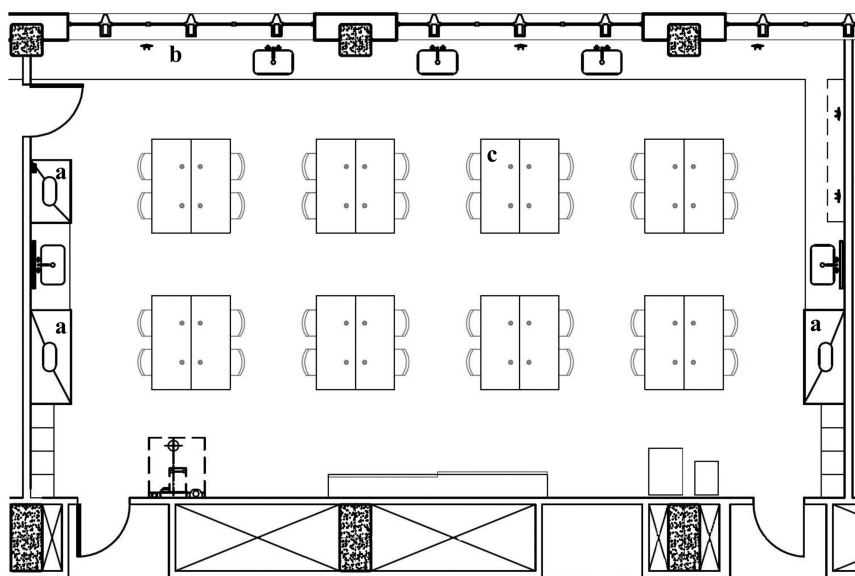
Laboratory layout for general chemistry. (a) Two six foot and one four foot hoods occupy interior walls, (b) exterior wall comprised of large windows and counter space for small equipment, and (c) moveable tables powered from floor boxes occupy the interior.
